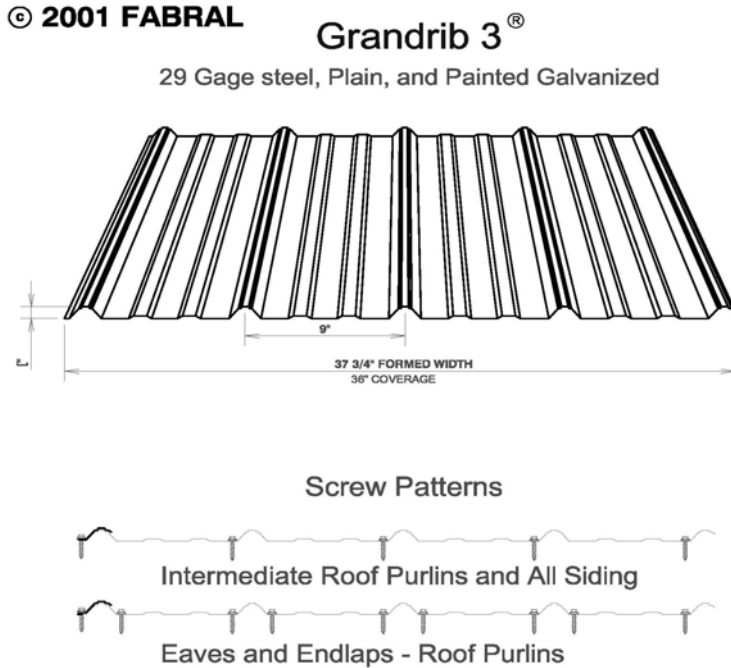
A. Sheathing profiles and fastener patterns for the roof and wall panels.
